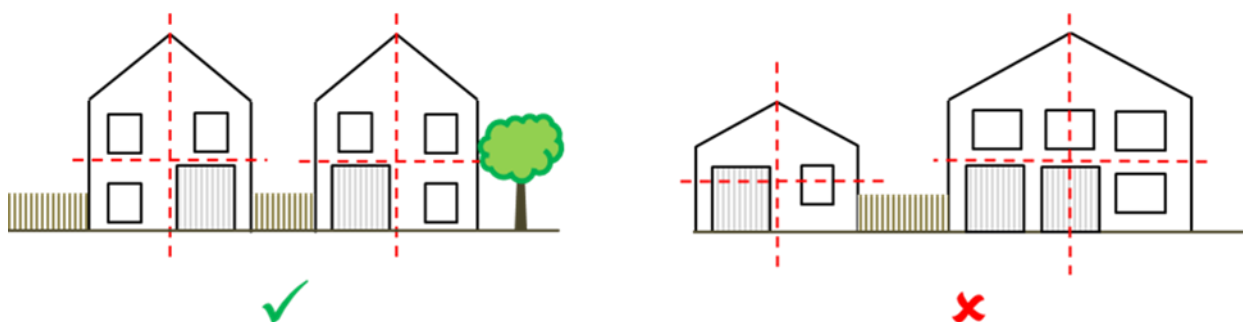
above: Garages integral to a dwelling exceeding more than a quarter of the principal elevation may have negative implications upon the character of the dwelling and the surrounding area
